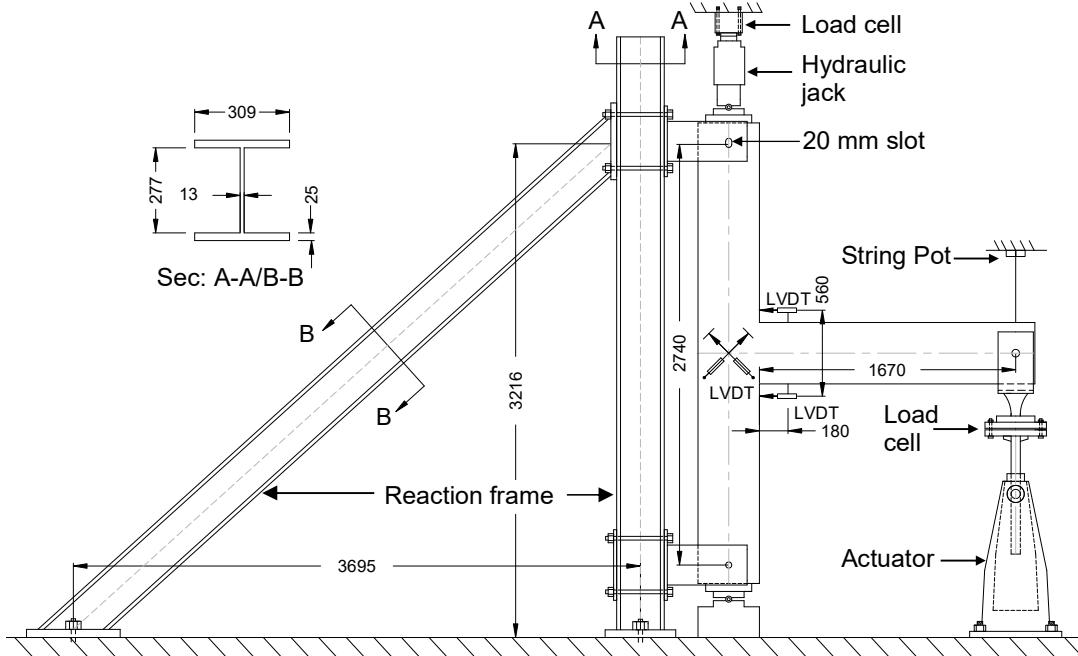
Test setup (all dimensions in mm; 25.4 mm = 1 in).
